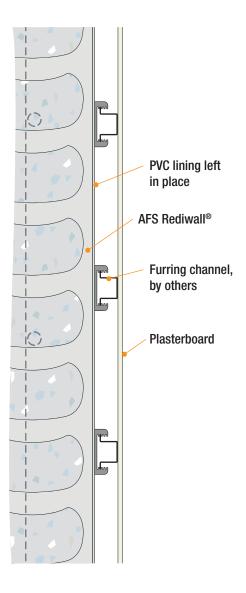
Rediwall® With Face Brick Exterior Skin — Finish Type (e)
